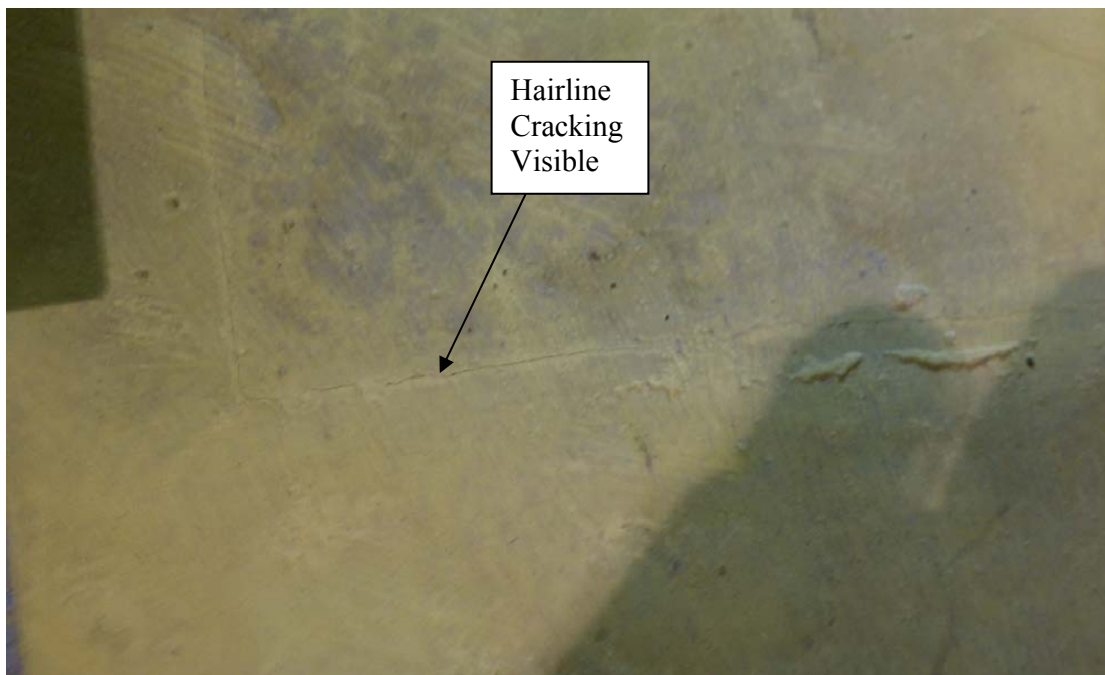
Hairline Cracking at Transverse Grout-to-Concrete Interface
